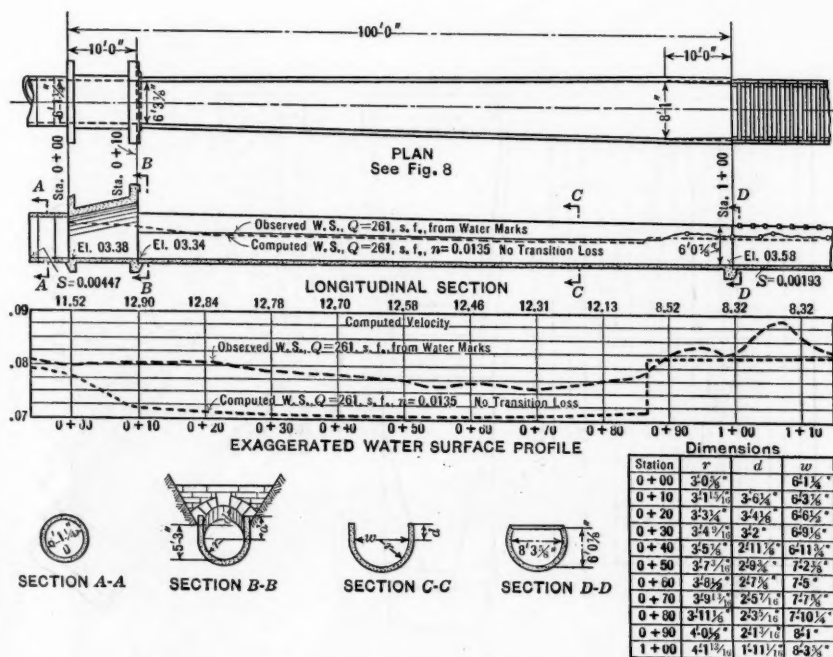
PLAN AND CROSS-SECTIONS OF OUTLET, COLUMNAR TUNNEL, TIETON CANAL.
